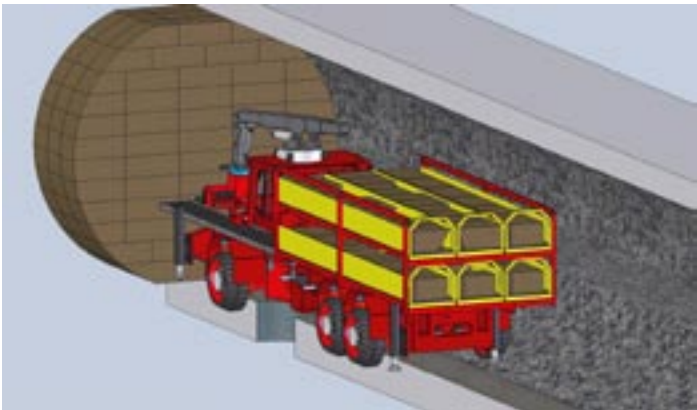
Backfilling of TBM-bored tunnels, block by block.
